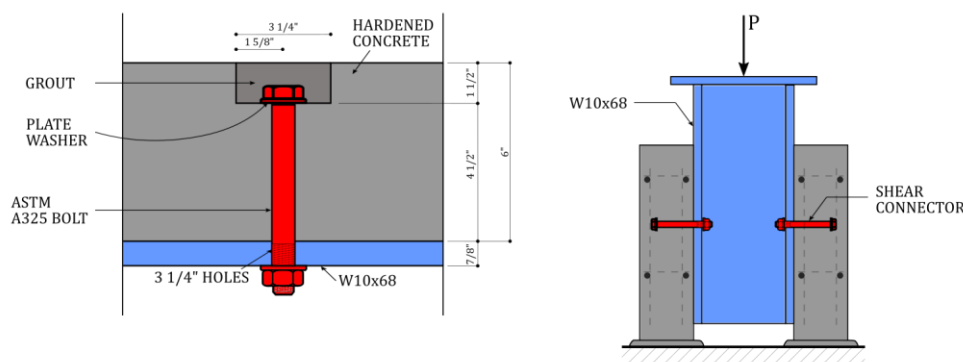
Detailing of the post installed friction grip connector and push specimen [21]
